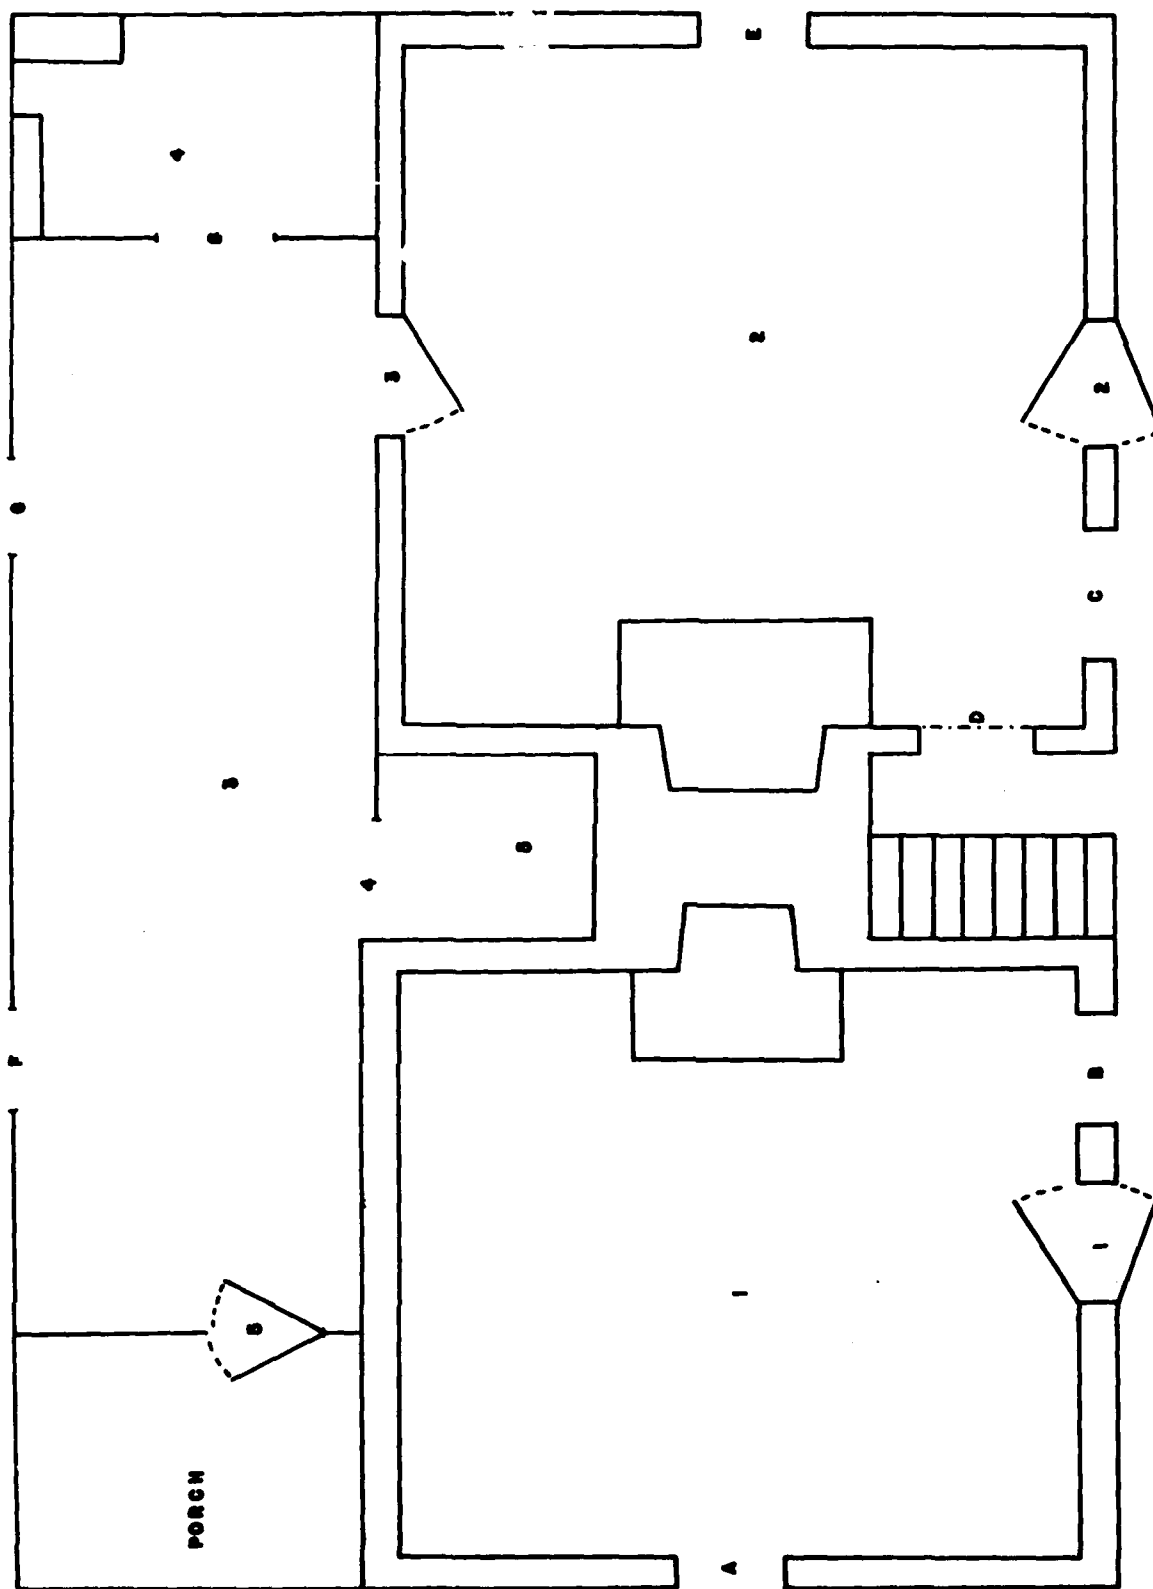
Lower story floor plan of the McKenzie dwelling on Tract 411.
